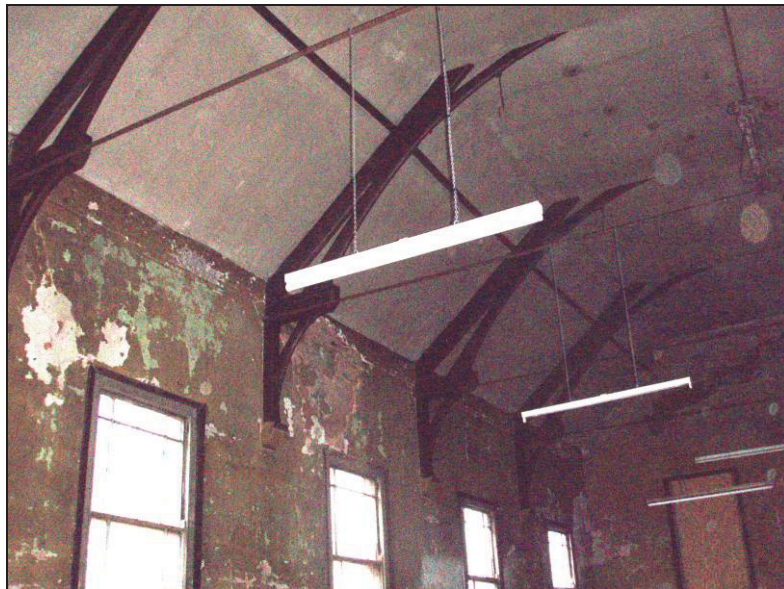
Interior of the Chapel showing wooden ceiling beams and windows on the north side.
